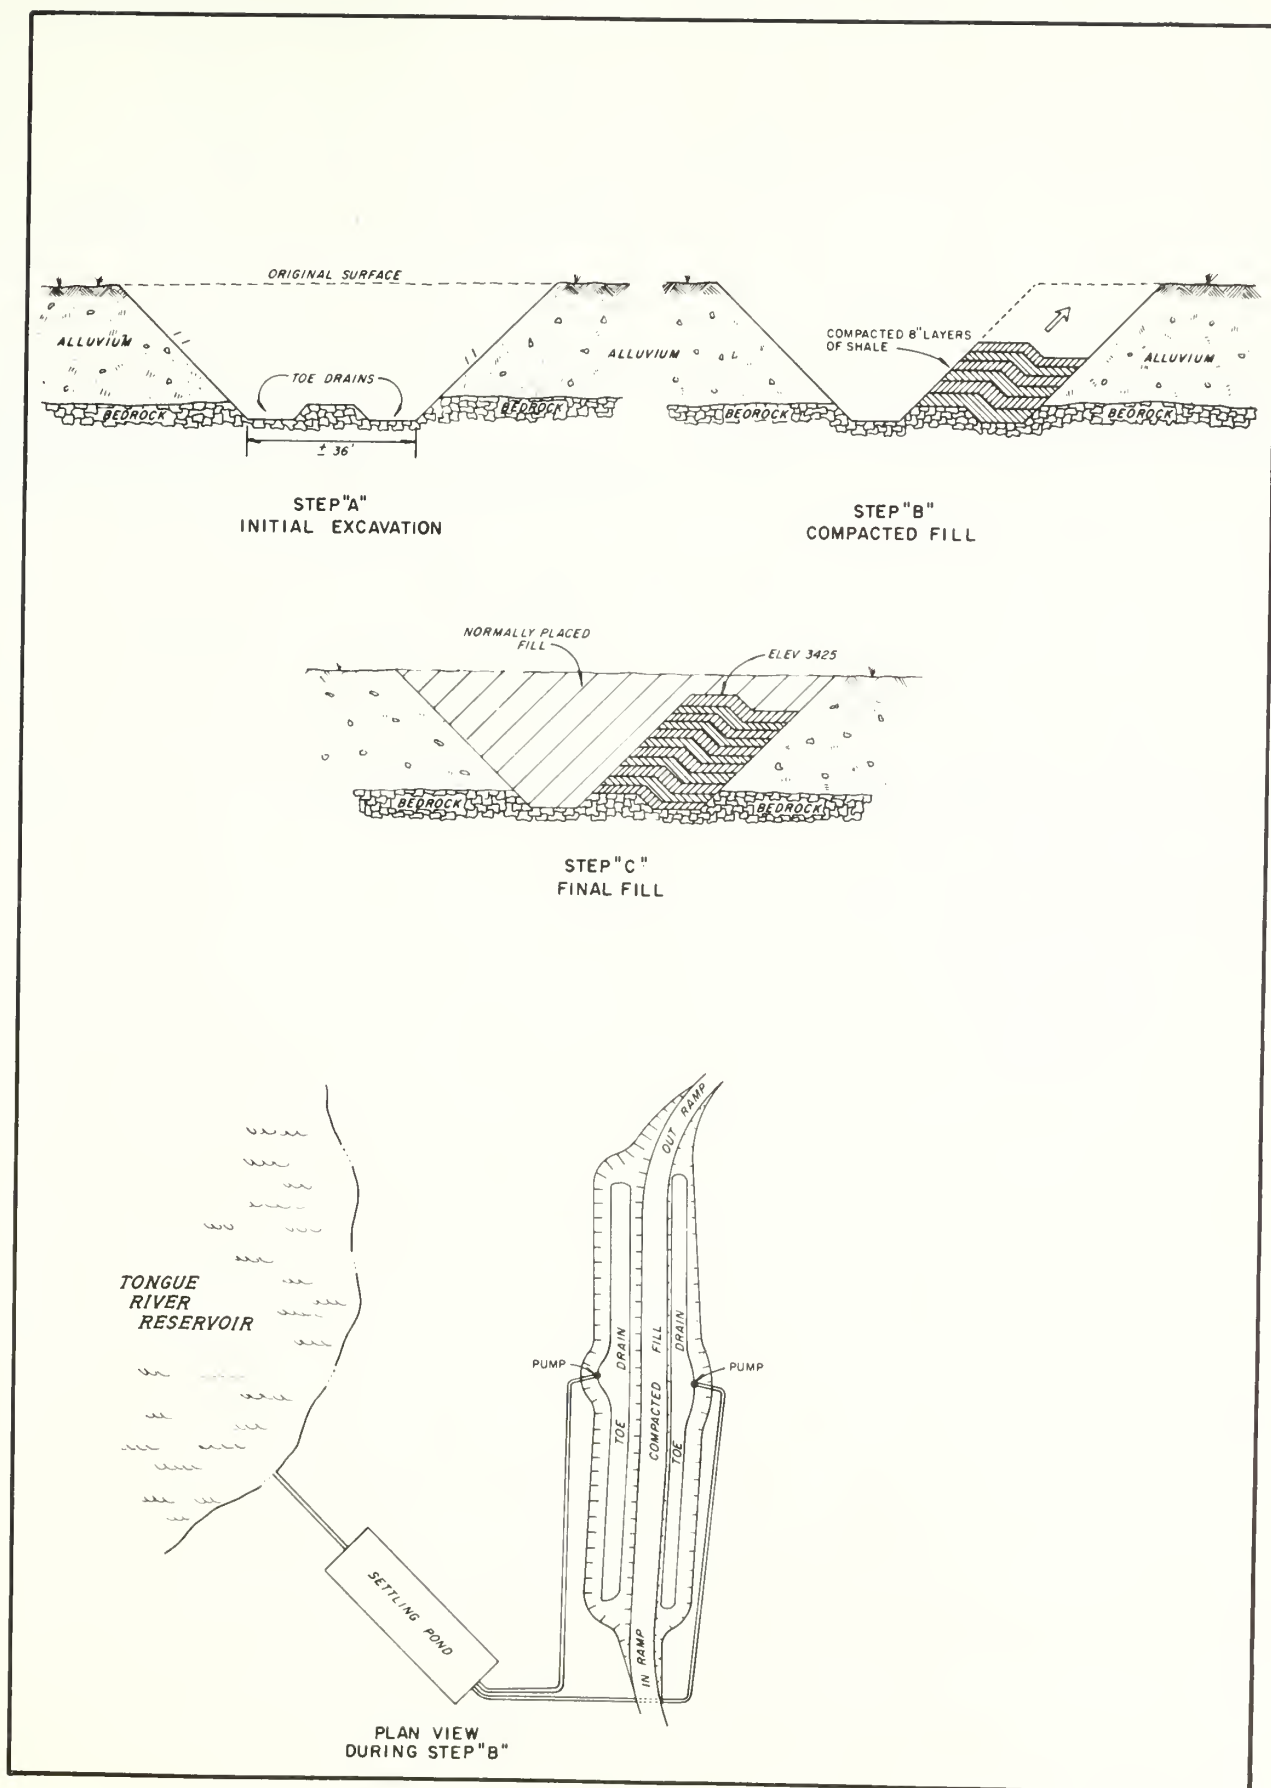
Diagrammatic cross section showing details of construction of ground-water barriers in the East Decker area.
